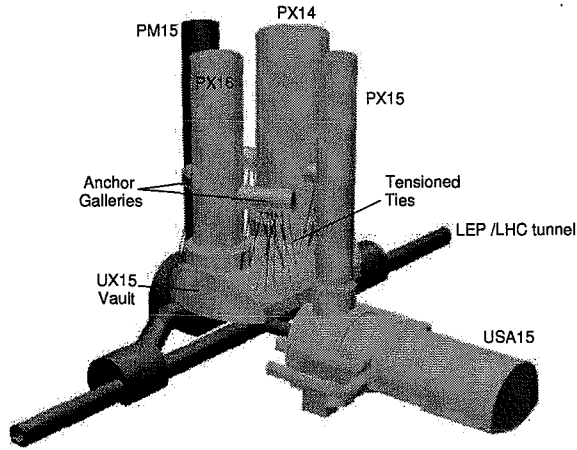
General layout of the Point 1 underground works prior to bench excavation, [46].
